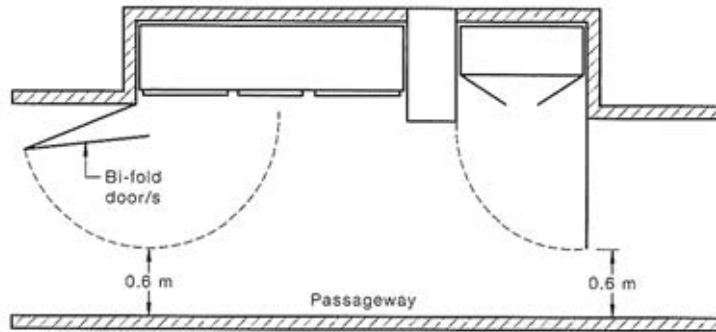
ACCESS TO SWITCHBOARDS—
